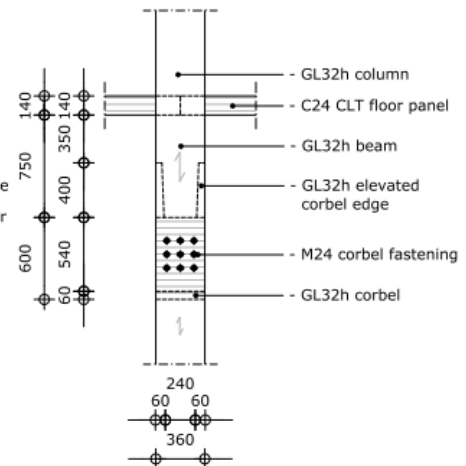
Cross-section F-F column-to-beam connection in mm
